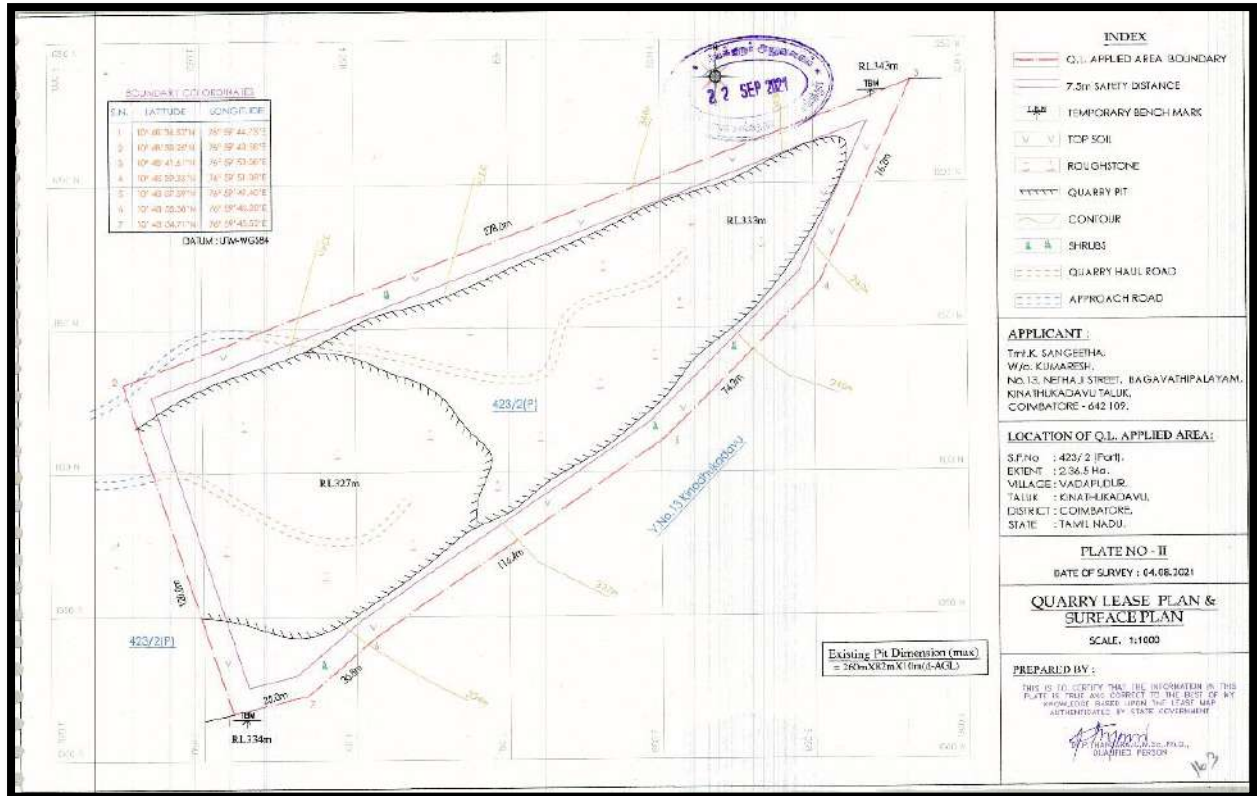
QUARRY LEASE PLAN & SURFACE PLAN
